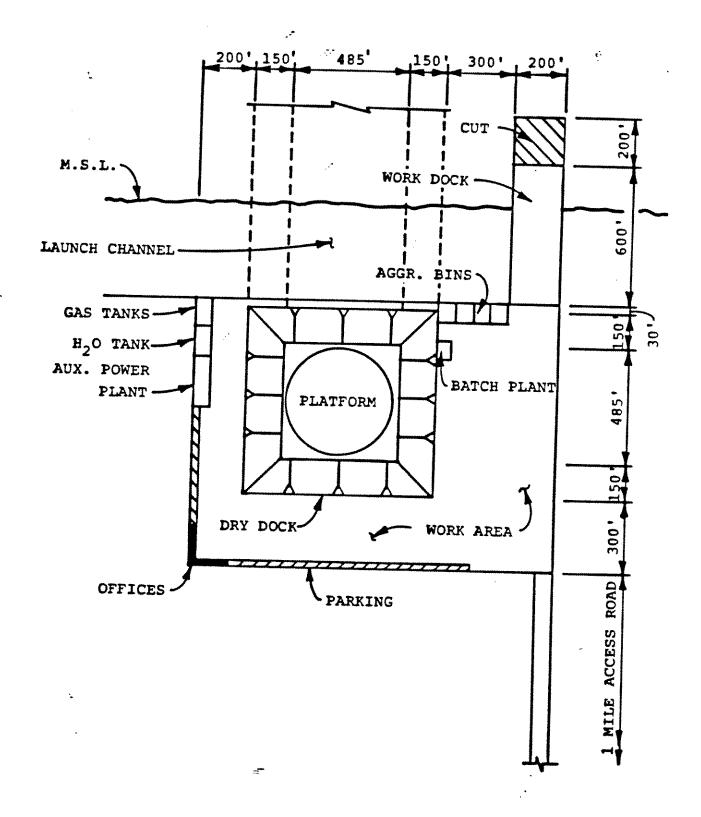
PLAN OF TYPICAL GRAVING YARD FOR CONSTRUCTION OF MONOLITHIC CONCRETE STRUCTURES
